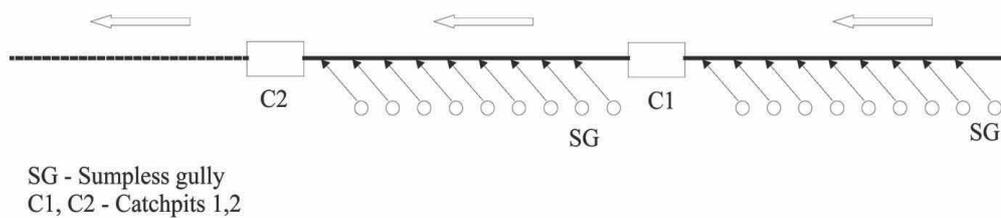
Schematic plan layout of the drainage system for worked example in Chapter 8
